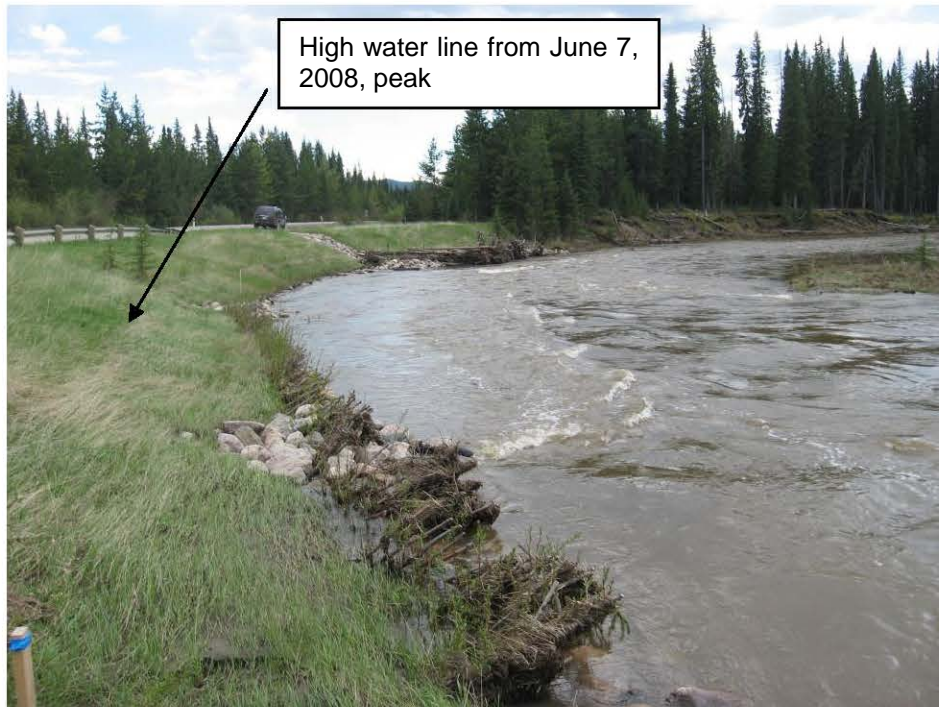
Looking southwest at repaired slump area at south end of site, June 12, 2008.
